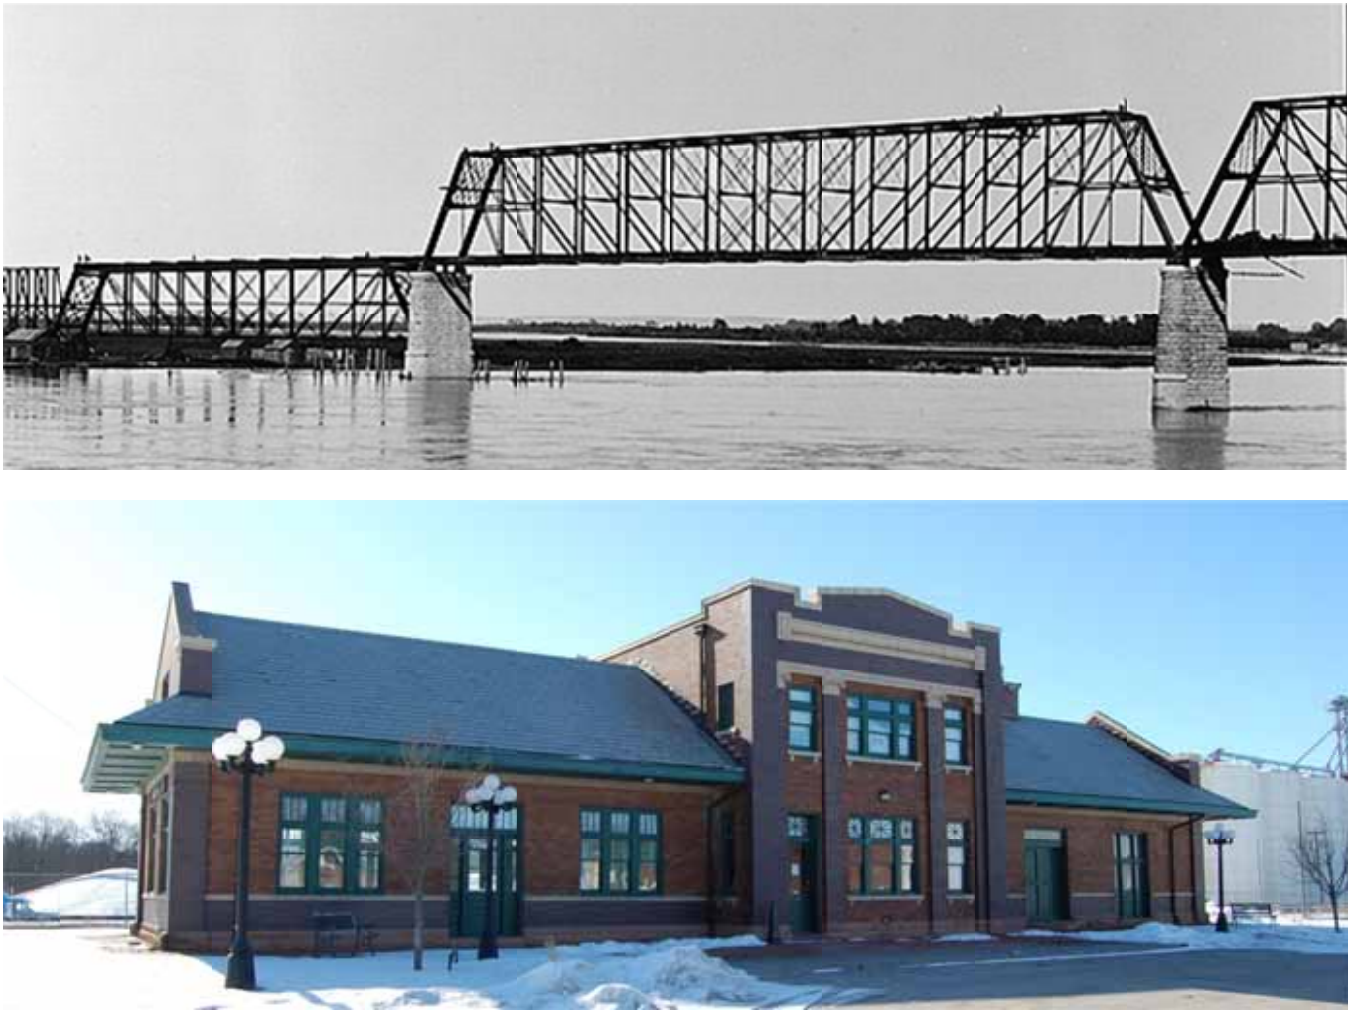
(above) Burlington Bridge – HAER Photo 45: circa June-July, 1888. ERECTION OF TRESTLE ON EAST APPROACH HAER NEB,66-NEBCI,5-45. (OT06:F-011 Non-extant 1984); (below) Burlington Rail Road Depot (OT06:E-001) (Photo 2010 APMA)
